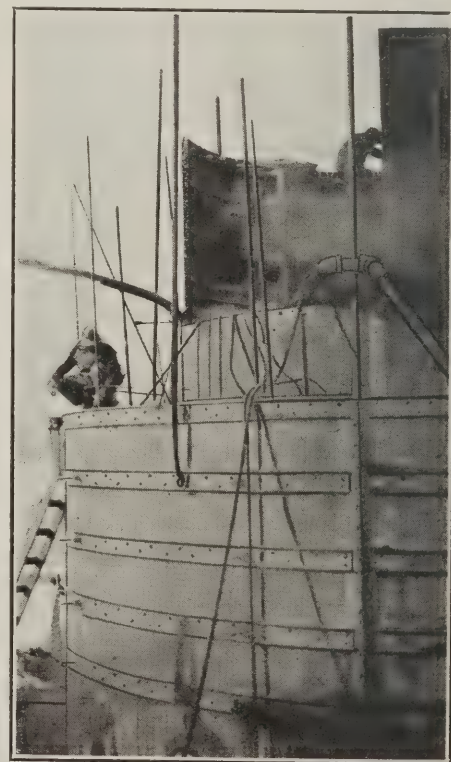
BLOWING DRY SAND FROM AUXILIARY SHAFT
